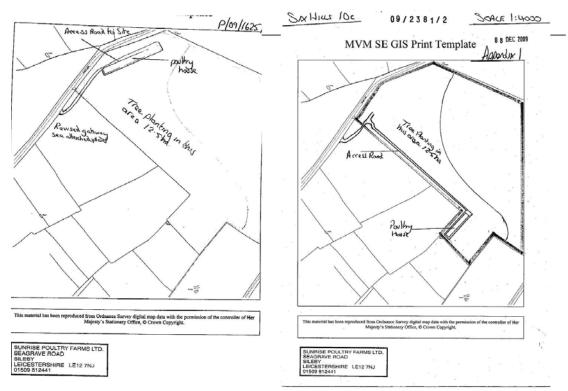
Site layout for poultry houses and access roads (Plans provided by client)
